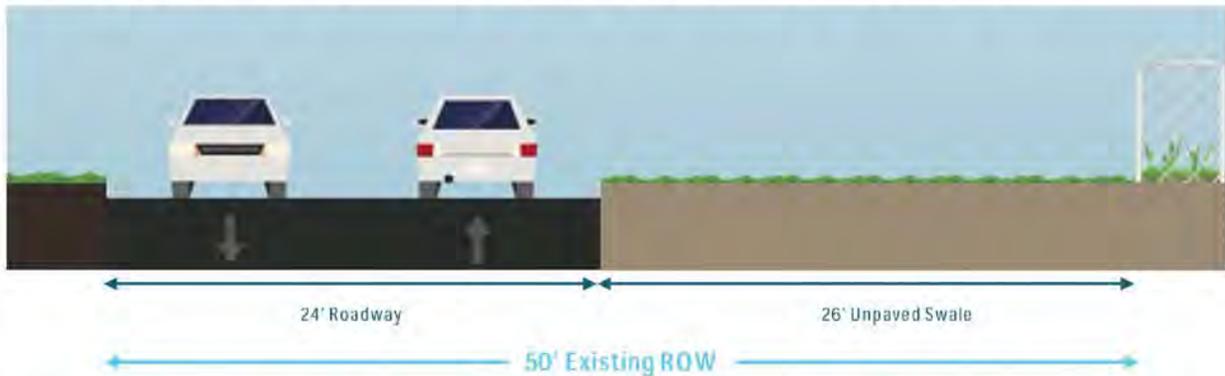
Existing Cross Section for E Dixie Highway, south of NE 209th Street
